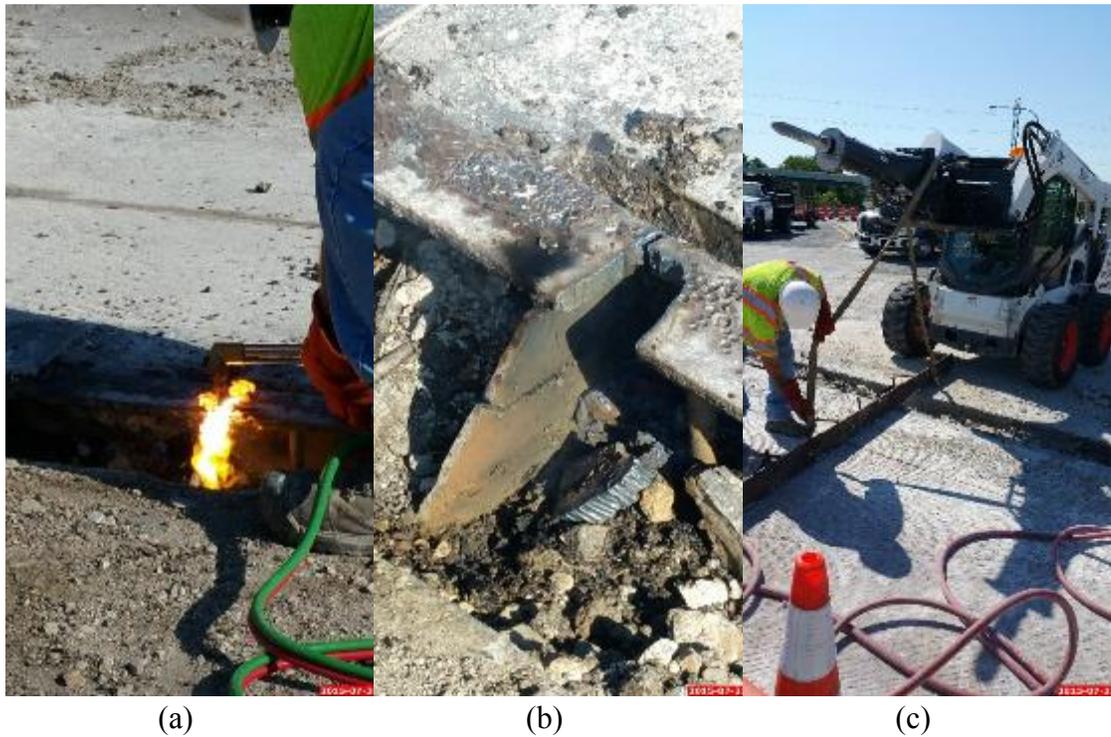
Armoring including (a) Heat Cutting/Torching of the Armoring, (b) Segmented Armoring, (with Torch), Momentarily to be Detached when Banged with Breaker and (c) Removal of Armoring with Skid Steer Loader
